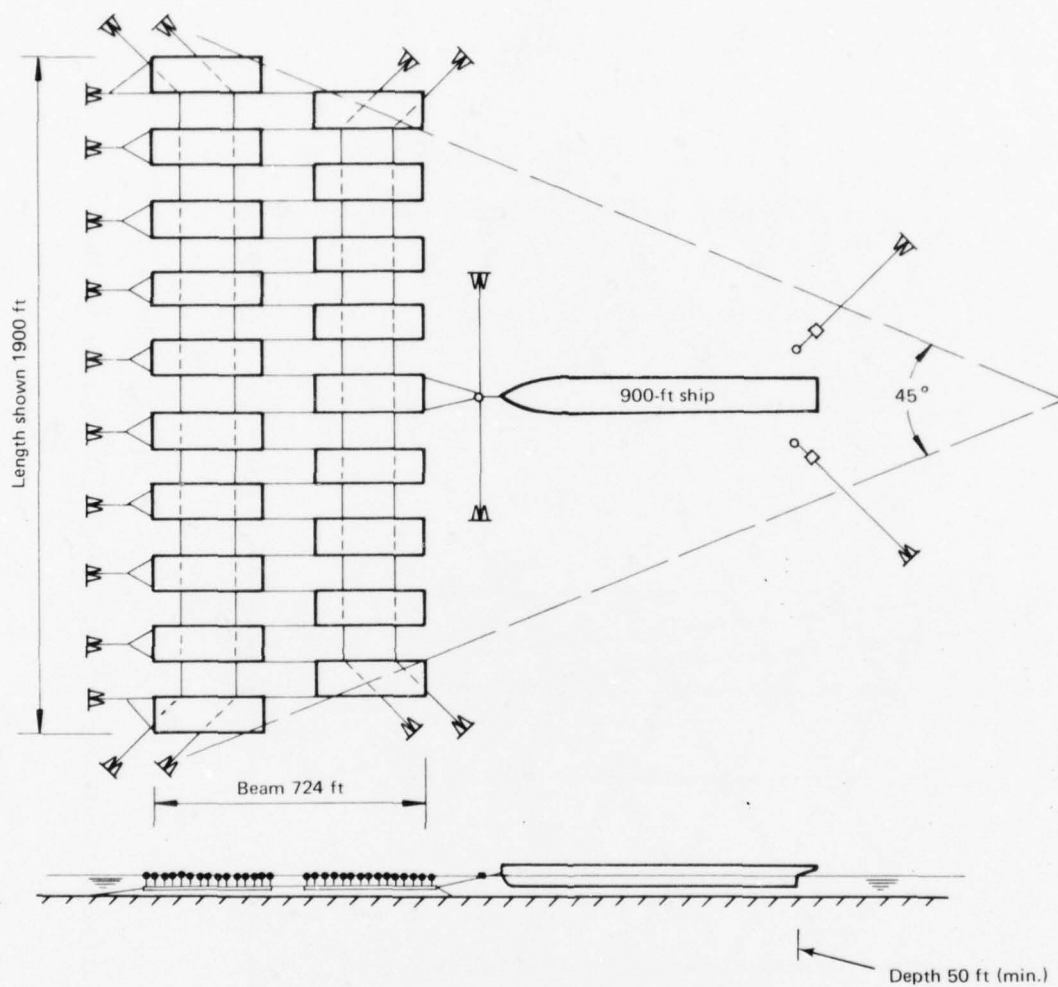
Tethered float breakwater: layout for articulated-frame ballast and mooring for weak alongshore current.
